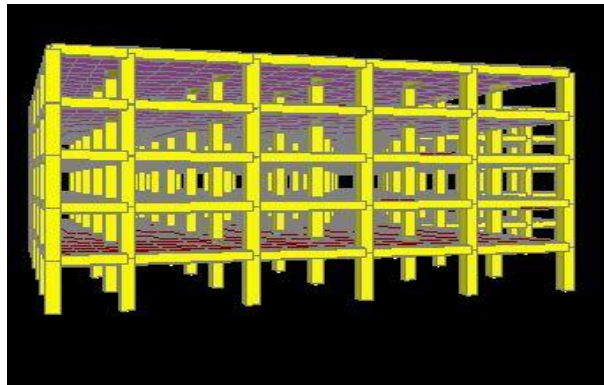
Design of the Multilevel parking #2 (SAP2000).
